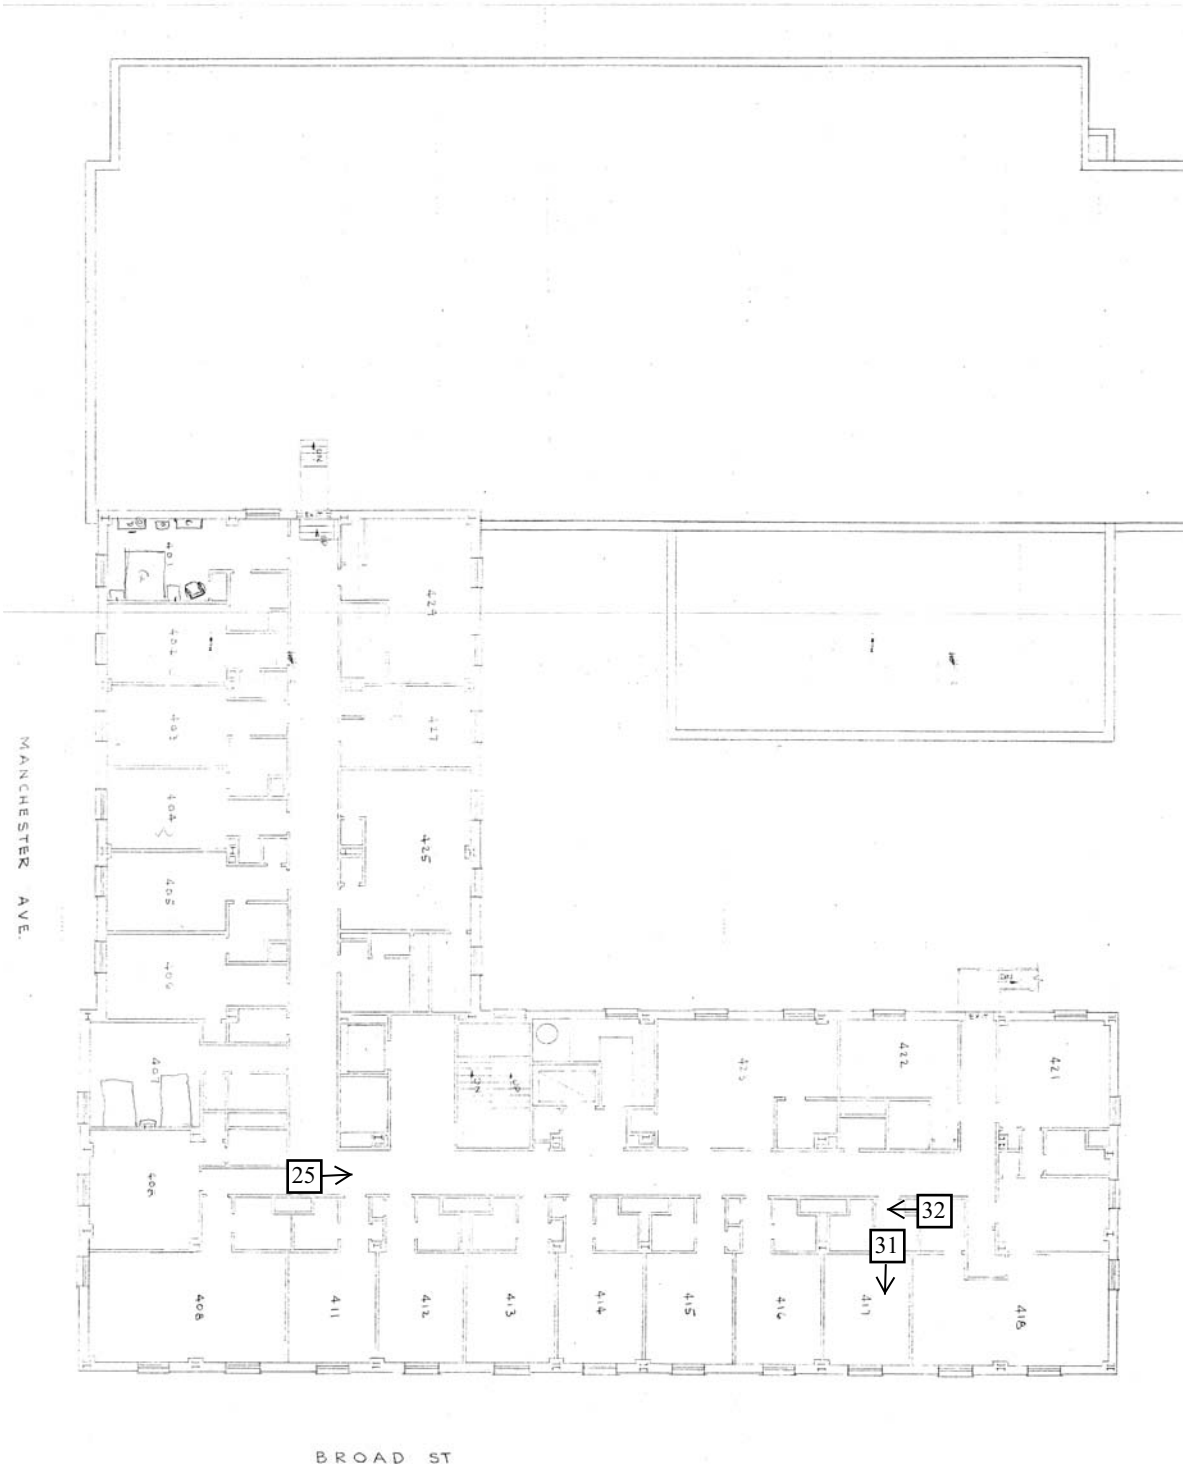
Floor plan of Forth Floor of the Hotel Manchester in Middletown, Ohio with photo locations
